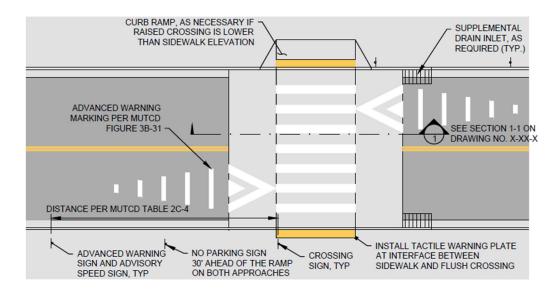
Typical Layout of Raised Crossing at Mid-Block Location
